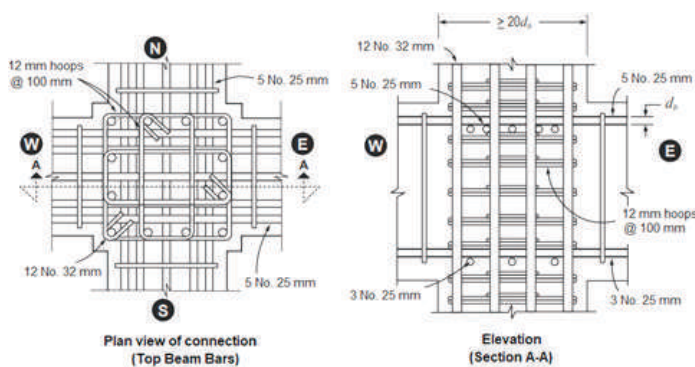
Example of typical interior joint detailing (Adapted from Moehle and Hopper, 2016)
